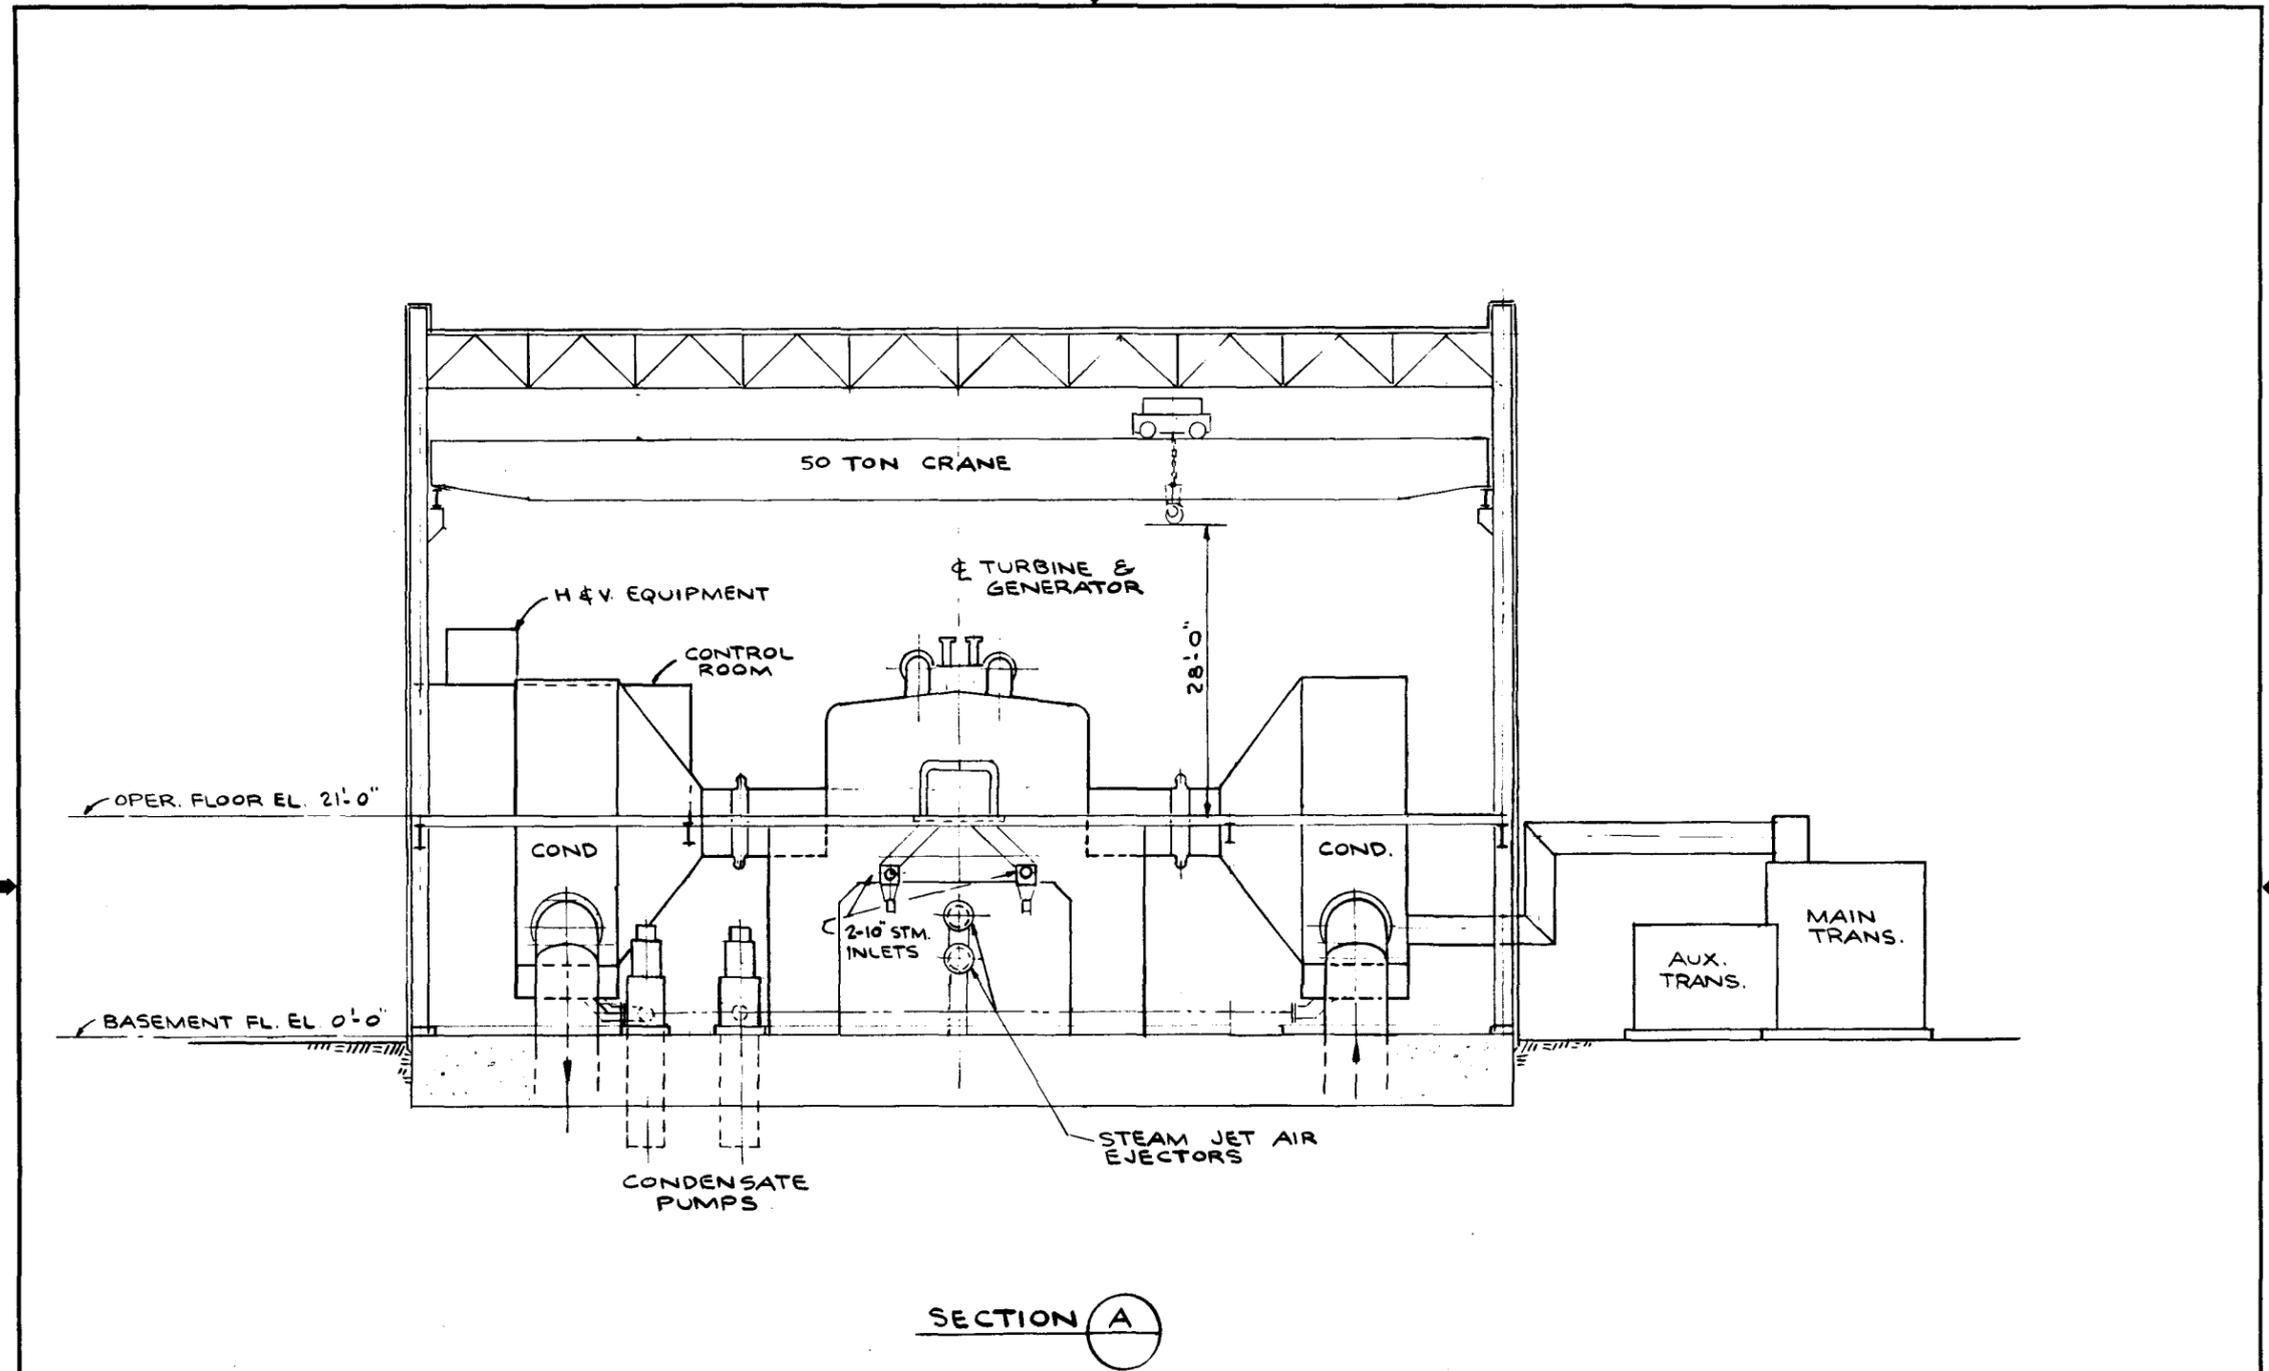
General Arrangement Turbine Building Plan
